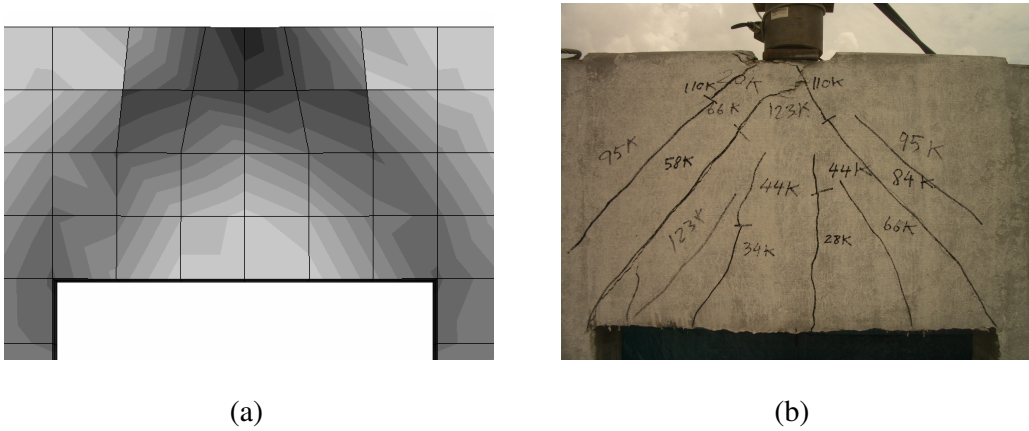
The failure cracks of the panel with door opening by FEM model:
